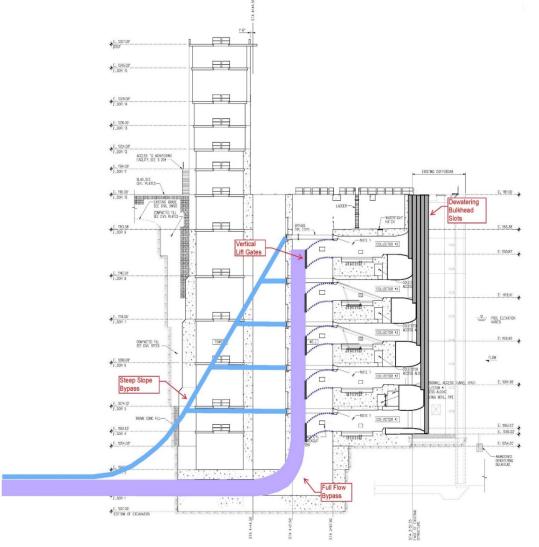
Conceptual drawing of a multiport collection and steep slope bypass
